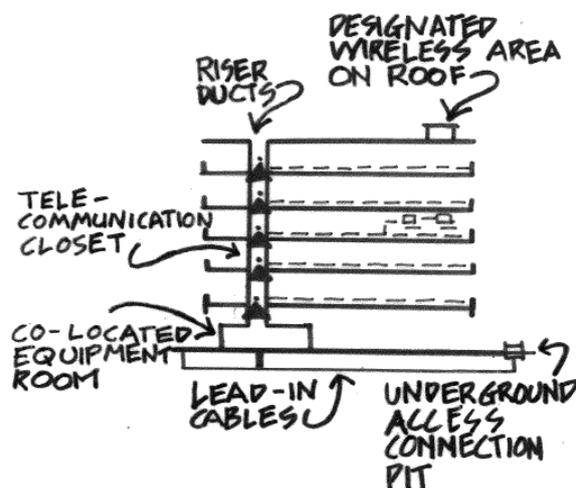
Example of Network Implementation for a Multi-Storey Building
